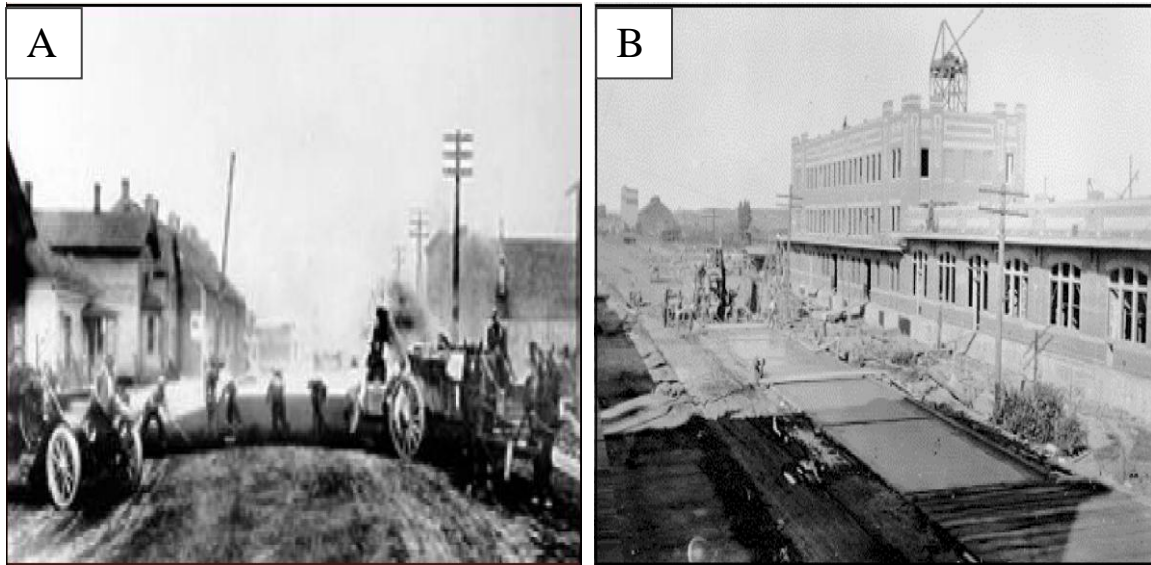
Pavement on a French highway in 1852 (A); Asphalt roads come to America in 1870 (B)[9].
